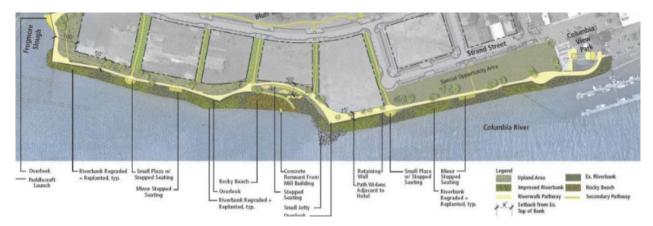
Riverwalk, St. Helens, Oregon - Site Plan
